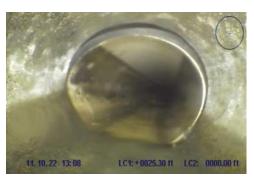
Pipe Repair in Sewer Segment on Portland Street SP00686
